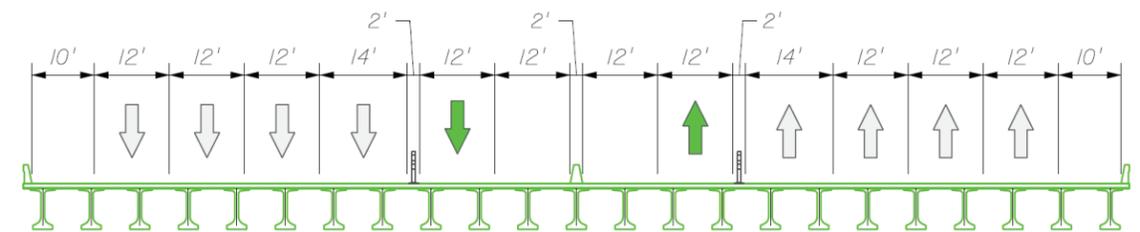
Existing Bridge Over SW 72<sup>nd</sup> Street
